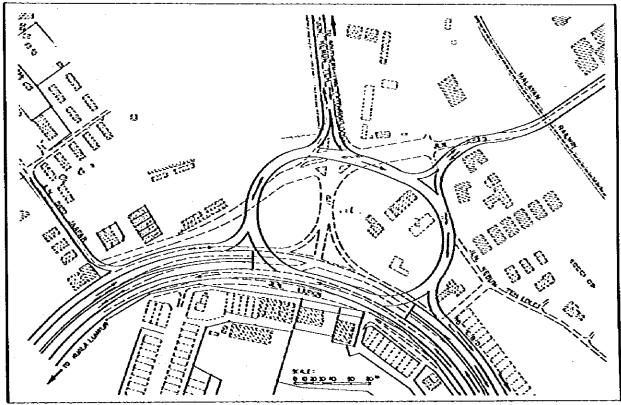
INTERSECTION IMPROVEMENT PLAN AT THE INTERSECTIONS OF JLN KEBUN TEN WITH JLN LARKIN AND JLN ABAD (PLAN 'B')
